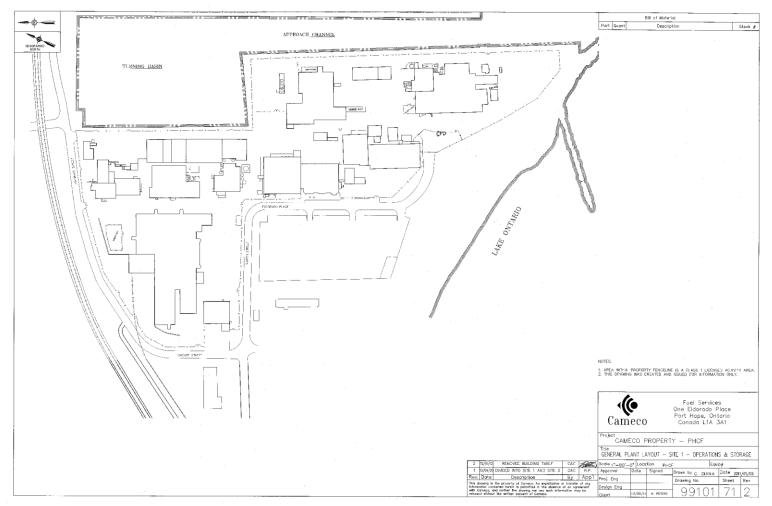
General Plant Layout Site 1 – Main Site Operations and Storage
